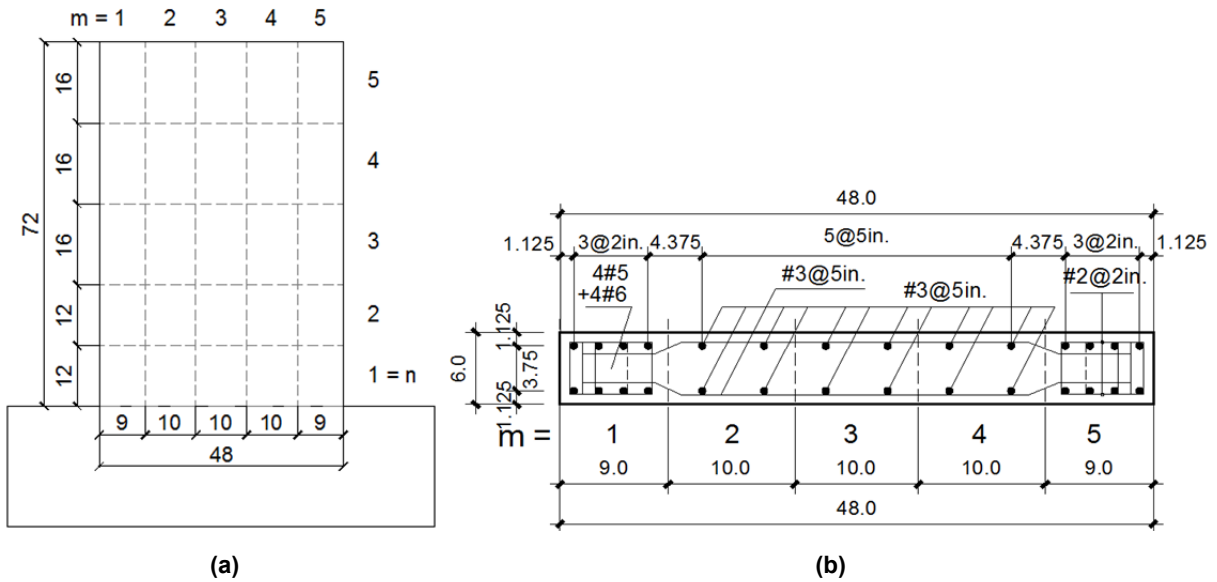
Model discretization: (a) plan view and (b) cross section.
